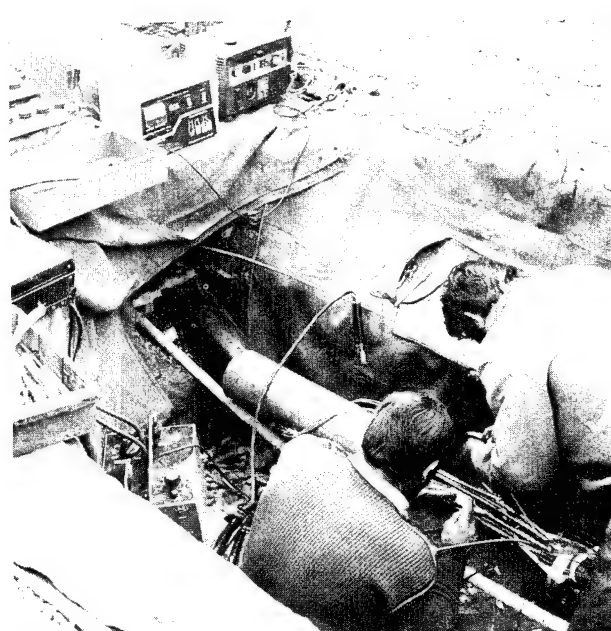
jointing coaxial pairs. The steel rod can be seen above the joint
